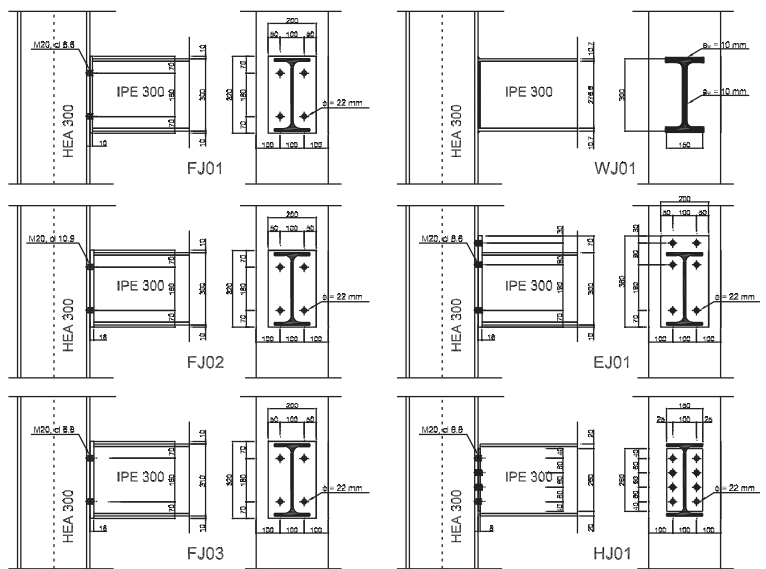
Geometry of the joints (1 in. = 25.4 mm).
